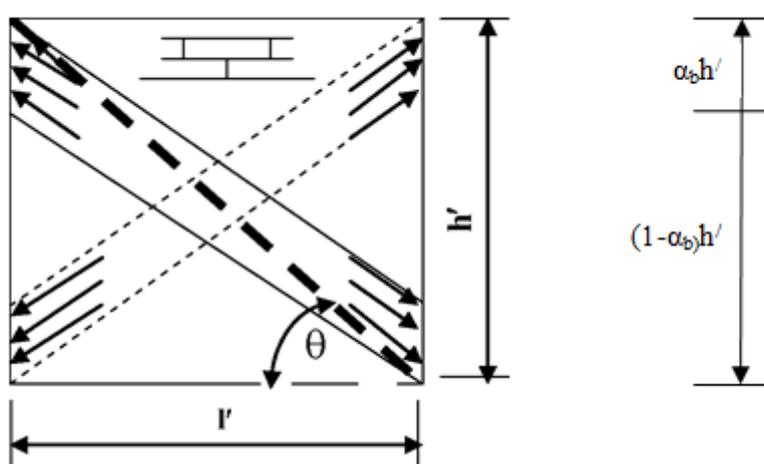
(b) Straw bale wall infill panel wall equivalent diagonal strut
